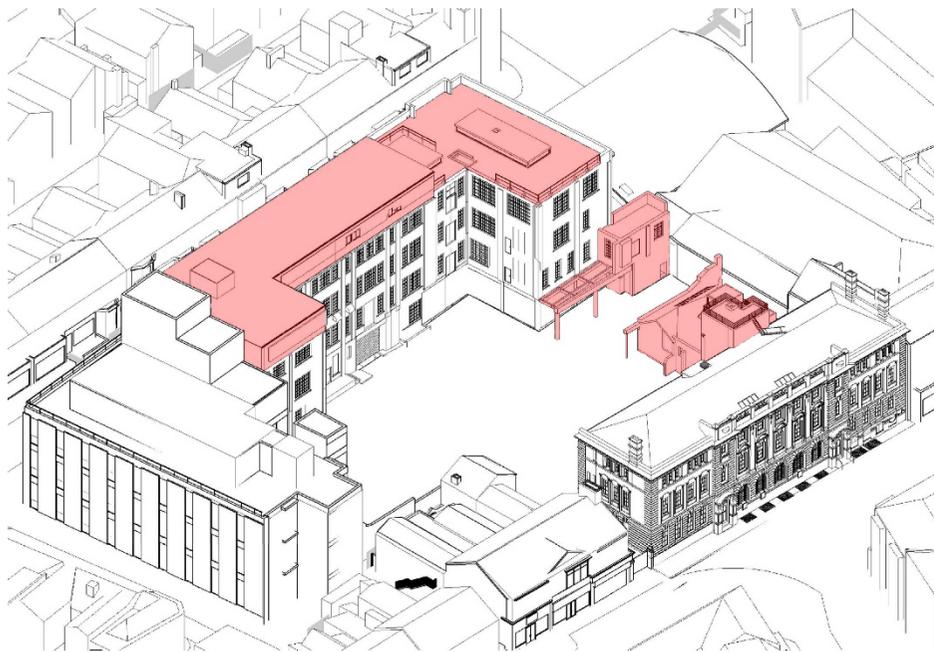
Axonometric Views highlighting proposed Demolition
